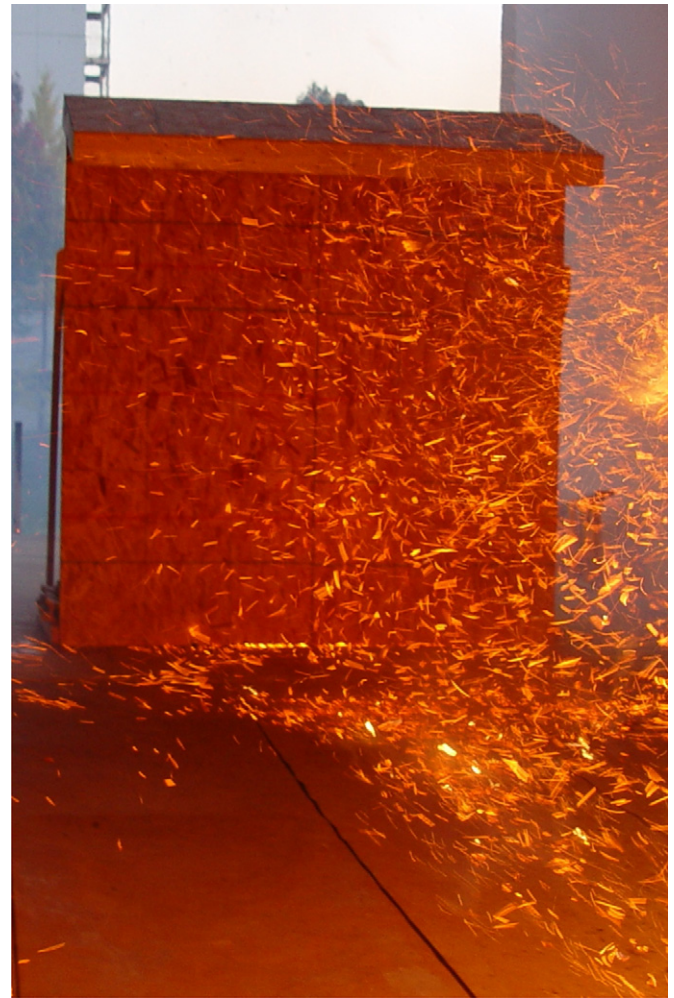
Image of wall fitted with eave under firebrand bombardment [33]. The wall dimensions were 244 cm by 244 cm with a 61 cm eave overhang.
